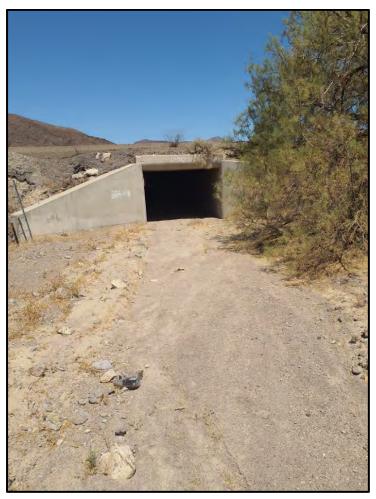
SubArea D. 35.142505°, −116.202964°. Unnamed Ditch culvert showing single channel with sediment sorting and support of large tree.
